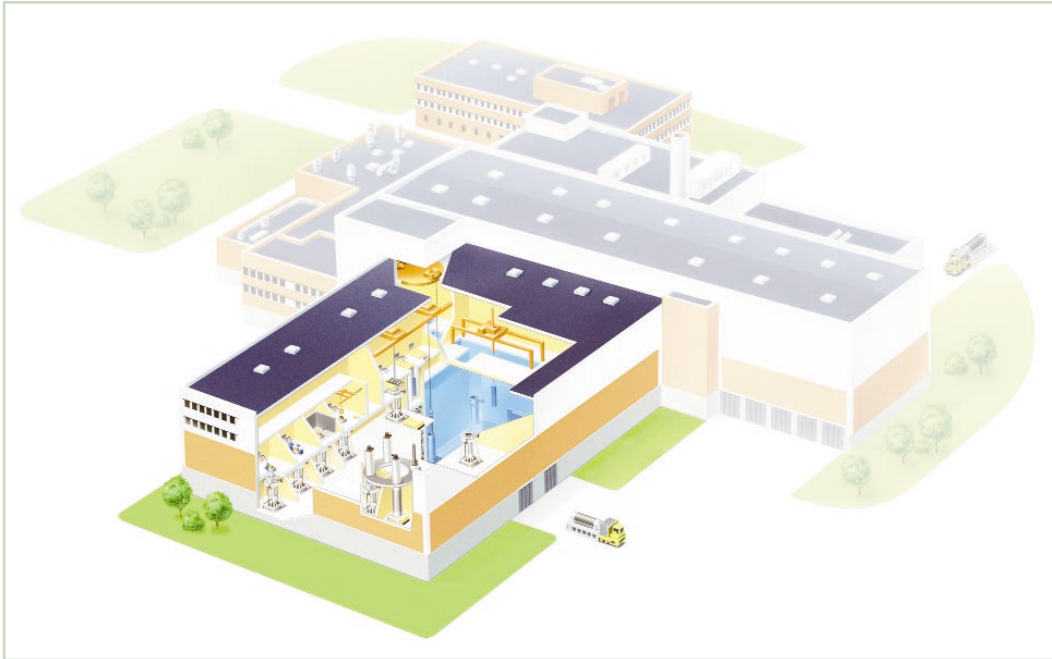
Possible layout of the encapsulation plant located adjacent to Clab.
